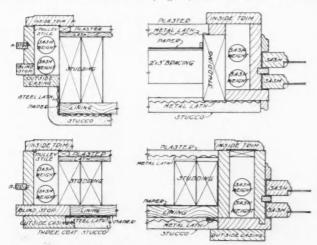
Proposed Method of Finishing Stucco Walls Around Openings.
